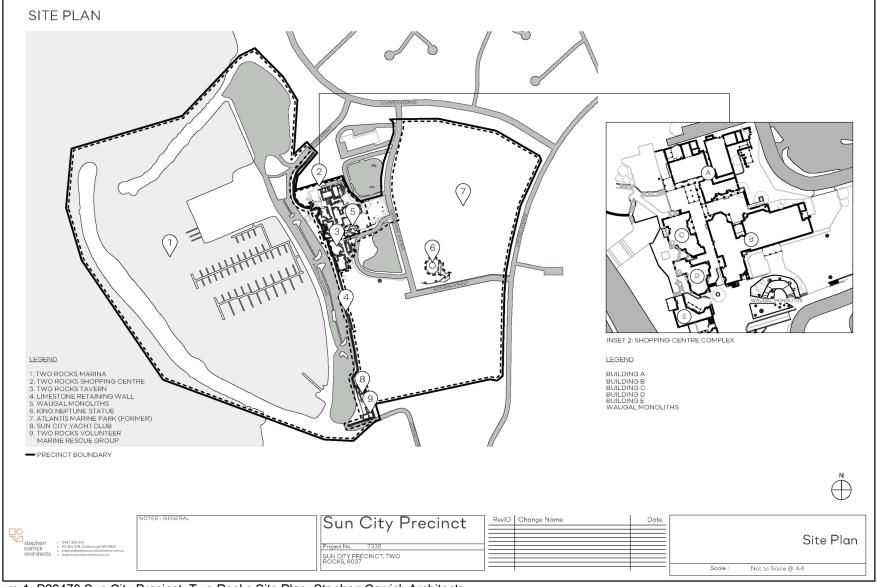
P26470 Sun City Precinct, Two Rocks Site Plan. Stephen Carrick Architects
